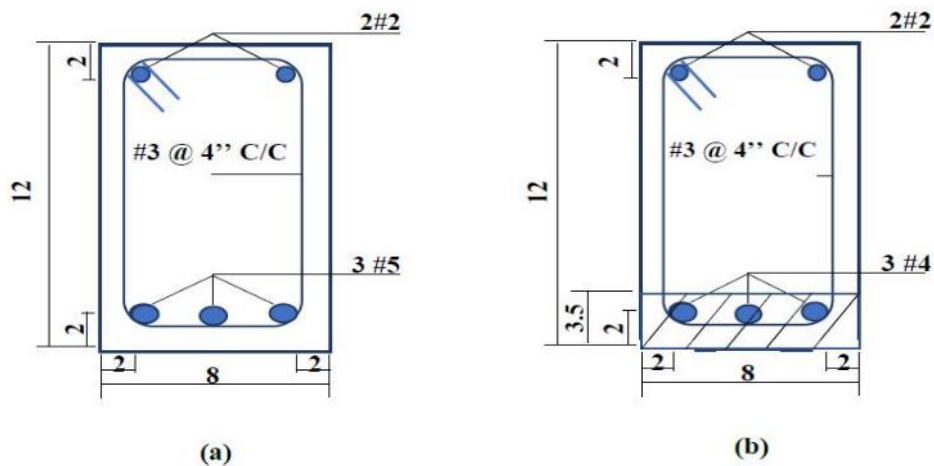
(a) Undamaged control beam and (b) damaged beam (Abdulhameed 2018) (all dimensions are in in.)
